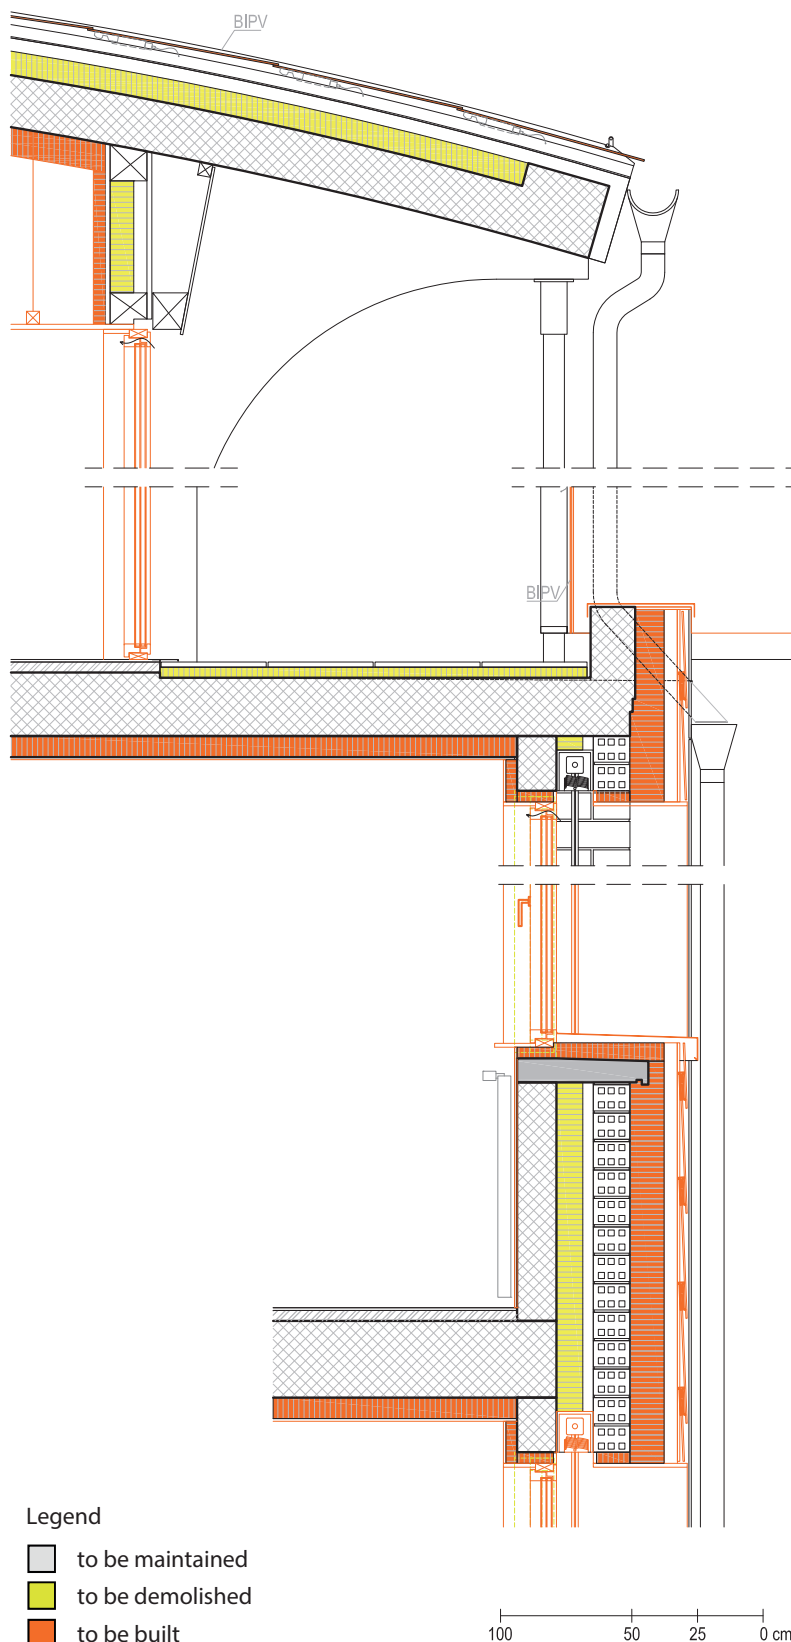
Façade constructive detail, S2-Renovation, Archetype 5.
